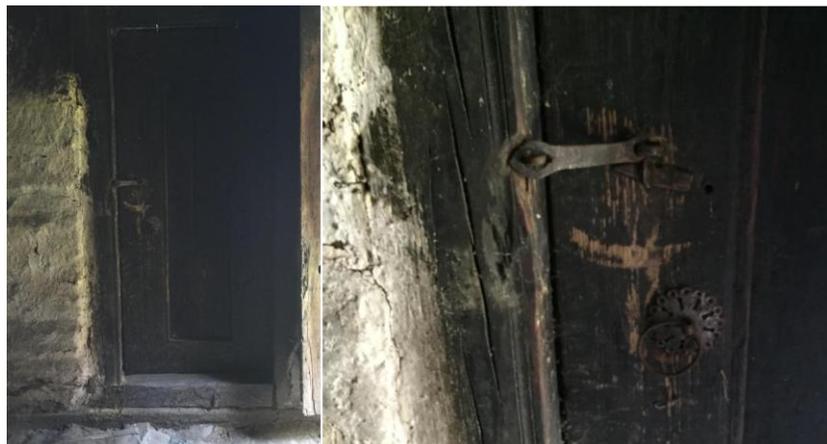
Door at the entrance to the room from the “house”/”kuća” space (left) and door detail (right)
